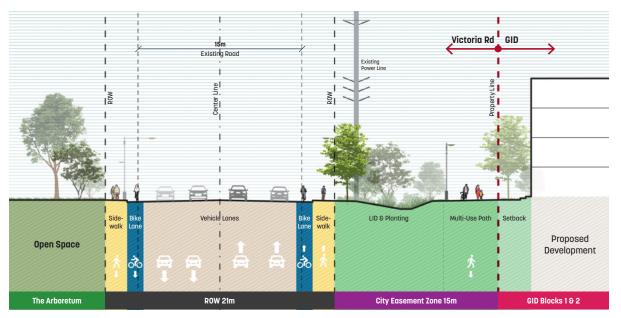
Victoria Rd S typical cross section, facing north (Sasaki, April 10, 2024)
